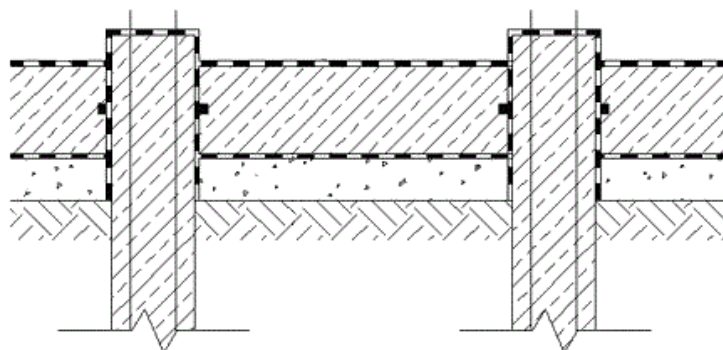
presents a scheme of the waterproofing system at the top of a pile that provides impermeability. In this system, a “waterstop” is placed to block the water flow. This piece must be carefully placed, ensuring that the whole pile head is covered. A faulty application of this system can make it into a leakage point.
